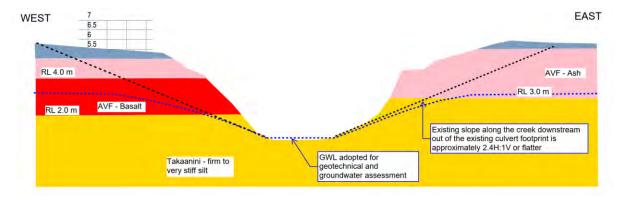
Figure Appendix C.6: Ground profile at retaining wall structure location and crossing Te Ararata Creek.
